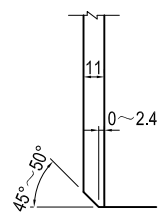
DETAIL OF IN-SITU LONGITUDINAL WELDING PART S=1:40
